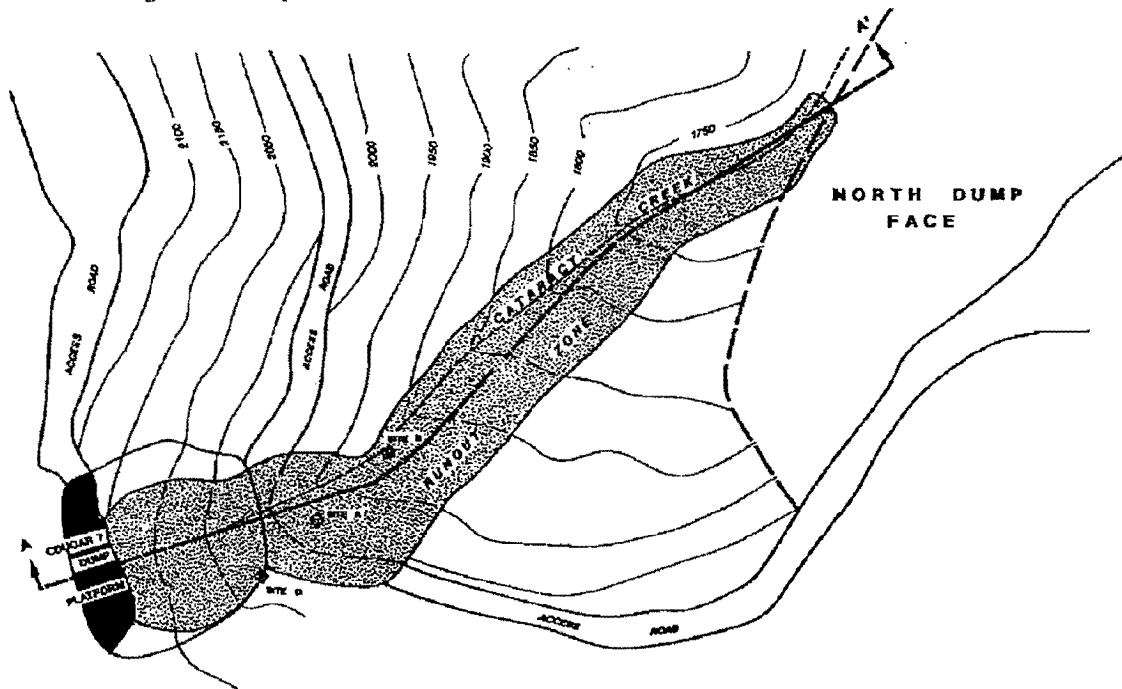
Plan view of run-out at the Cougar 7 dump failure at the Greenhills Mine (after Dawson et al 1998)
